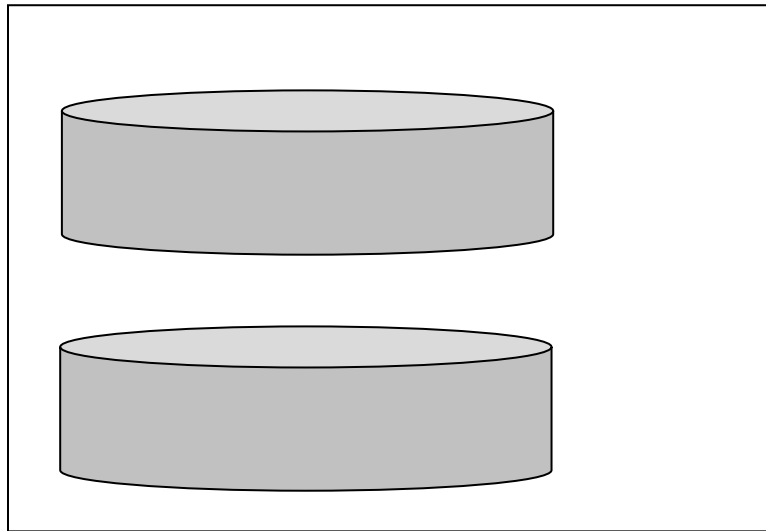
The Schematic Shows the Two Pieces Compacted Soil Samples.
